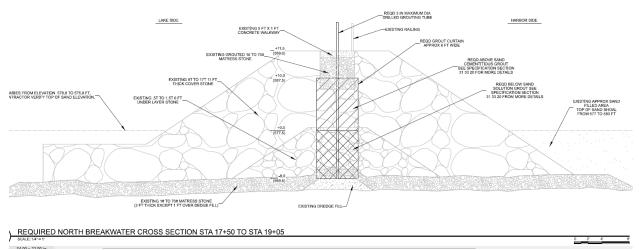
PROJECT PLANS - NORTH BREAKWATER CROSS SECTION
